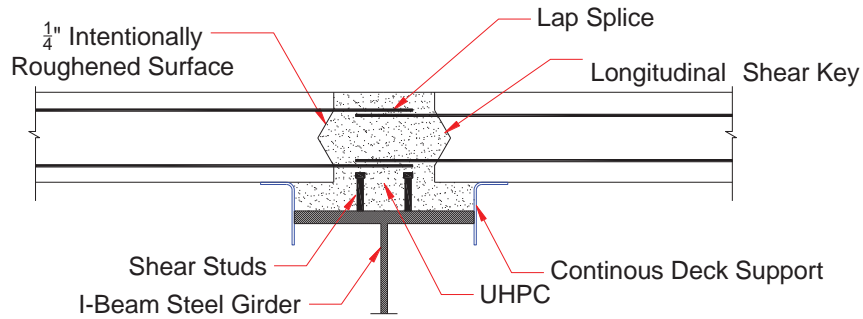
Panel-to-Panel Connection over Steel Girder (Graybeal 2014)
